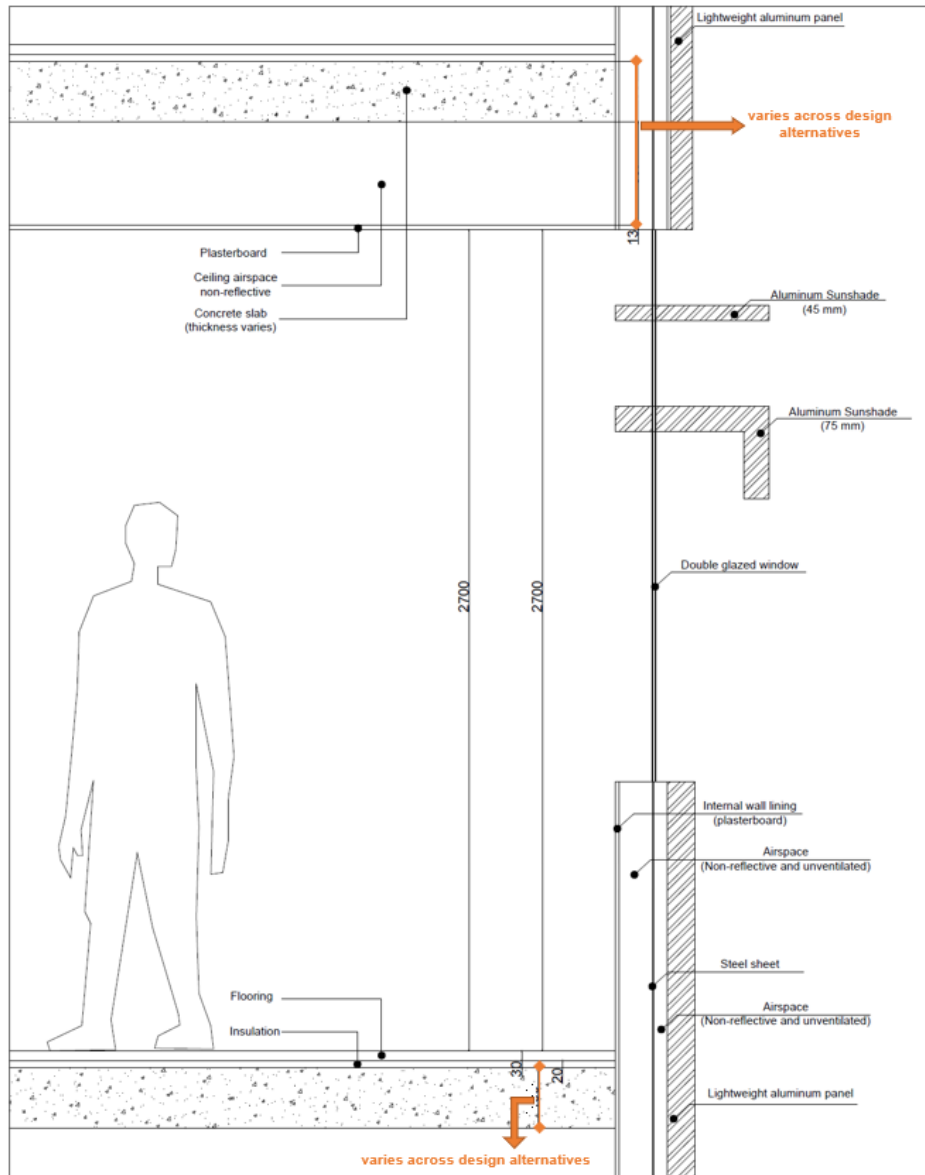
A typical cross-section for each floor. Changes in structural system impact floor-to-floor heights which have indirect impacts on embodied carbon as demonstrating on the MACCs.
